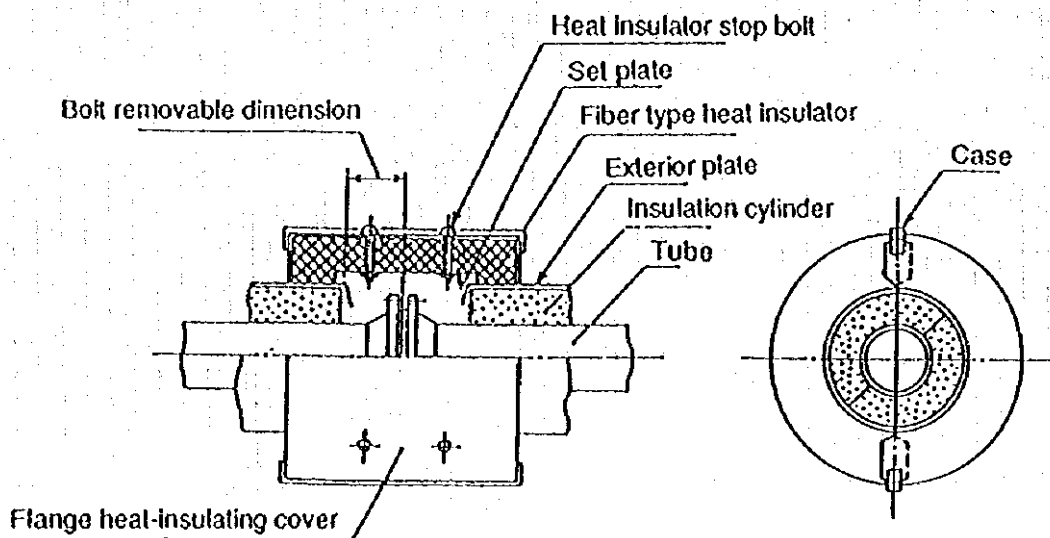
Standard Drawing of Thermal Insulation for Valves and Flanges
